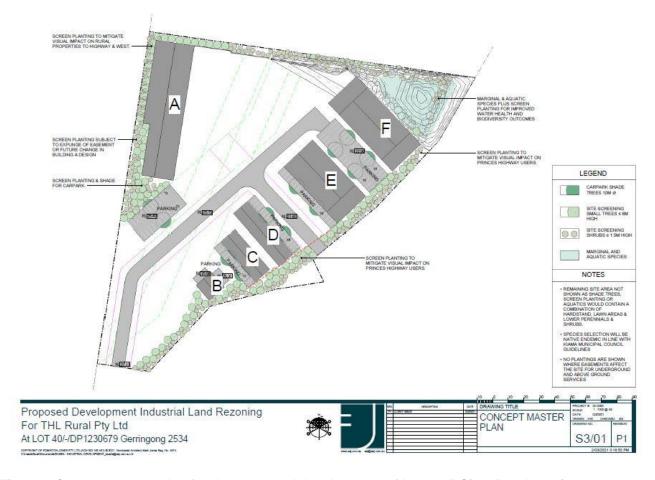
Concept master plan for the proposed development of Lot 40, 5 Sims Road Gerringong (source: Sims Road Gerringong Planning Proposal, Allen Price & Scarratts)
